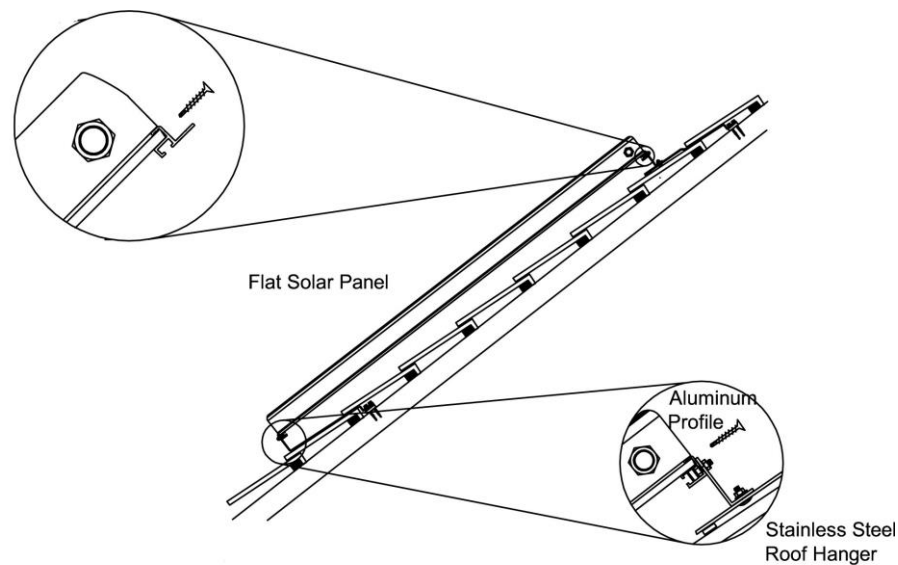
Joule On-roof Solar Collector Roof Hangers Fixing
